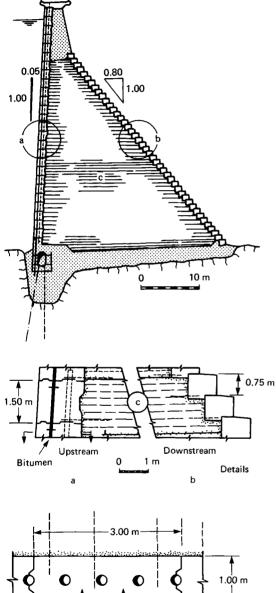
Alpe Gera dam; rollcrete with sheet steel waterproof element
